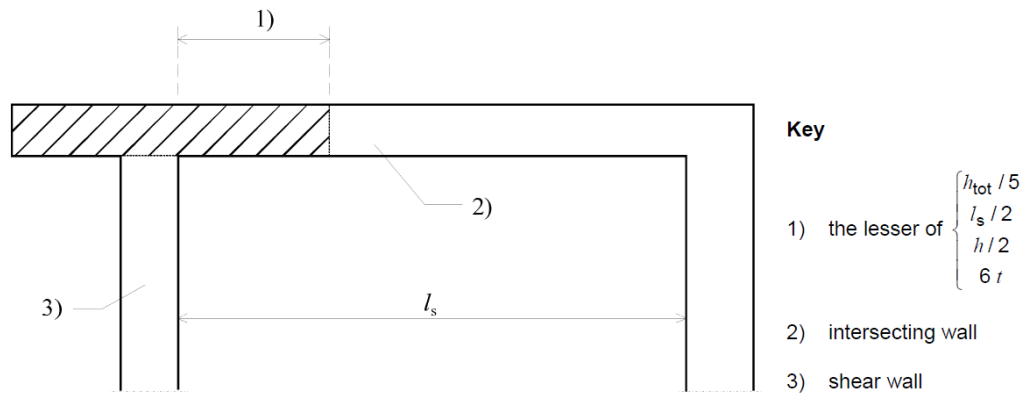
Definition of the length of the intersecting wall that can be considered to act as a flange
